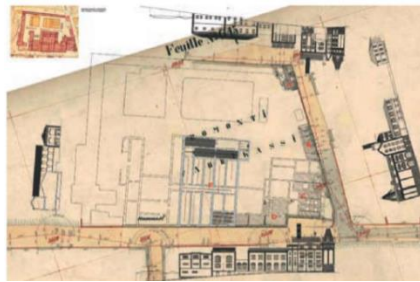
Bomonti Beer Factory, Restitution, Layout Plan (URL-1)
